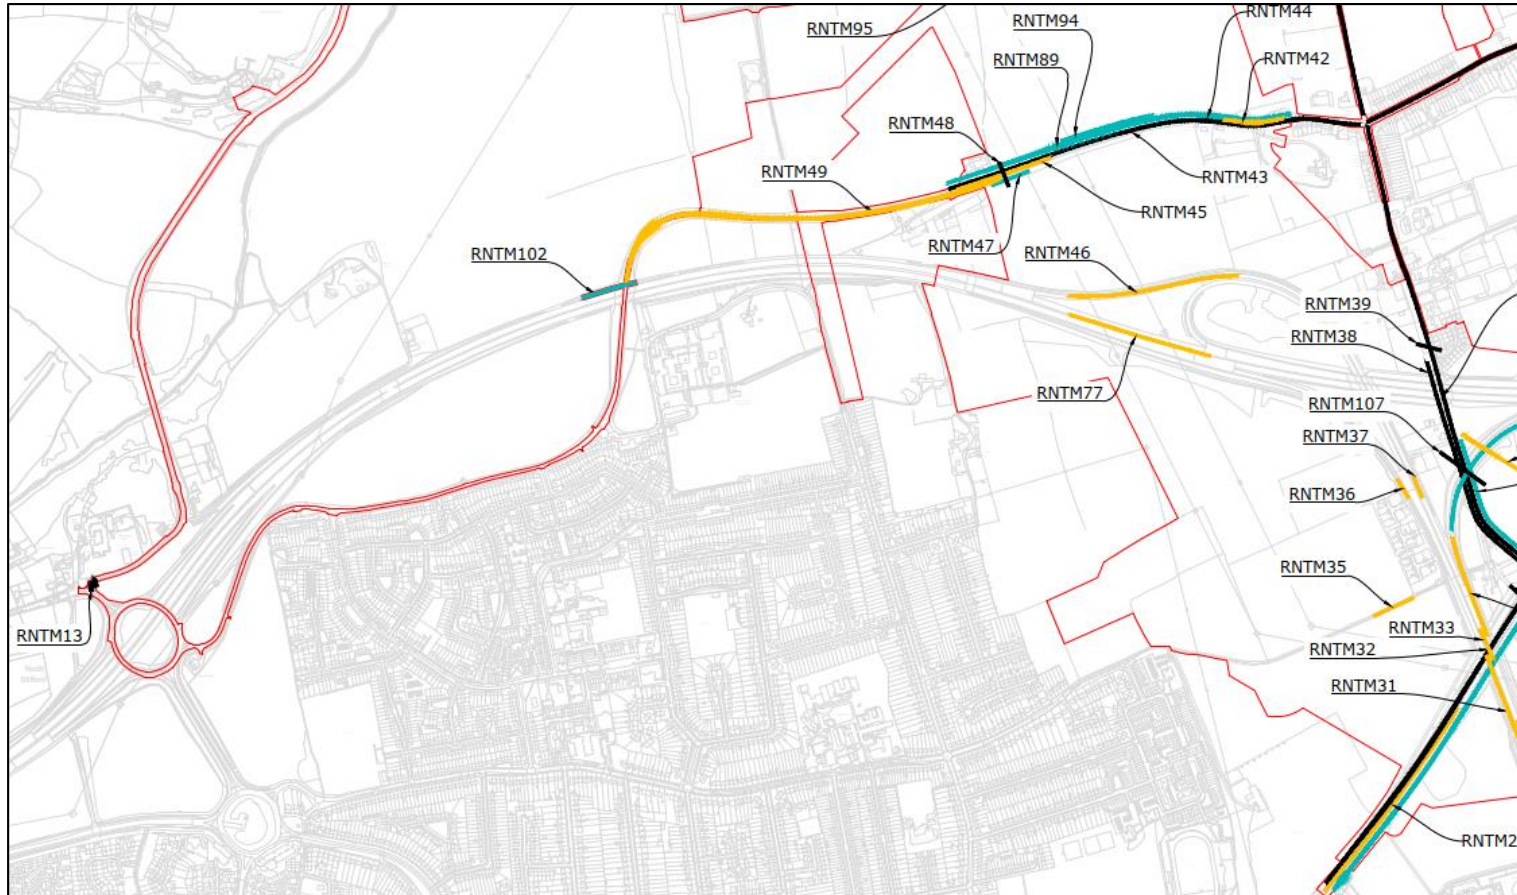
Roads North traffic management measures location plan (6 of 8)
